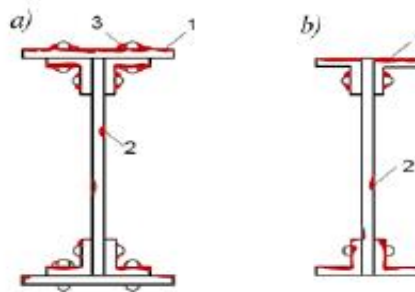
Corrosion damage of full-wall spacer devices and main beam bearings: a - with horizontal chords; b - without horizontal chords; 1 – surface corrosion; 2 - local corrosion; 3-rivet in the rivet zone
